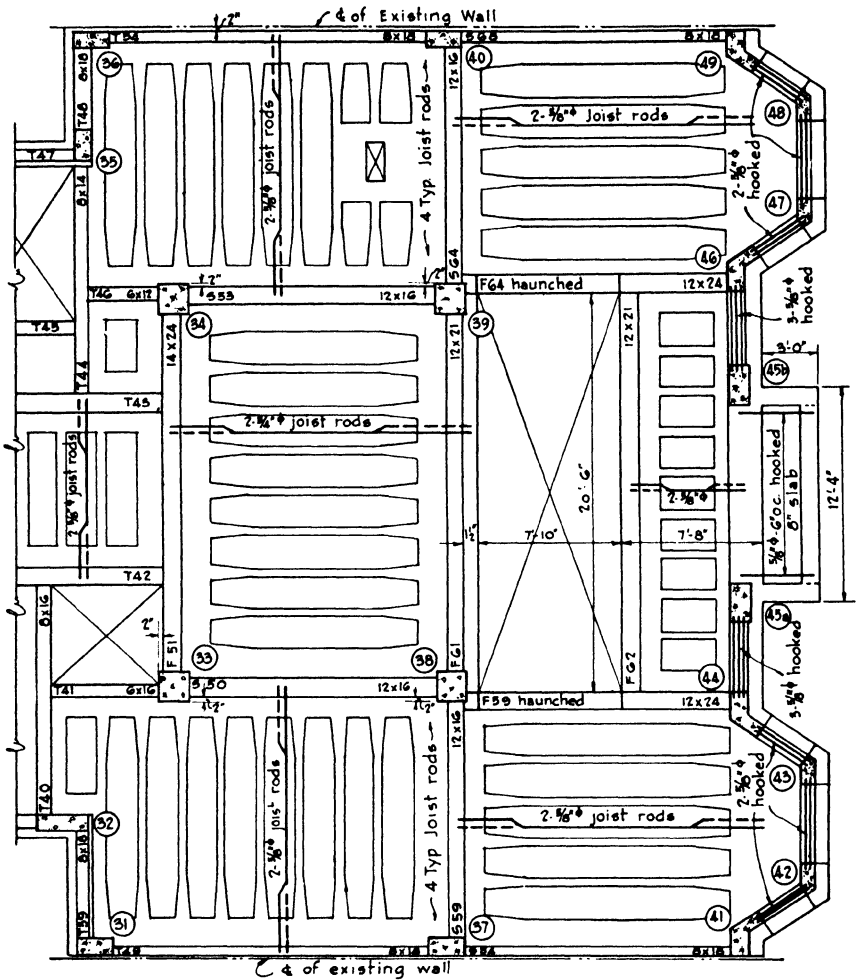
Erection Plan for Reinforced Concrete Floor.
